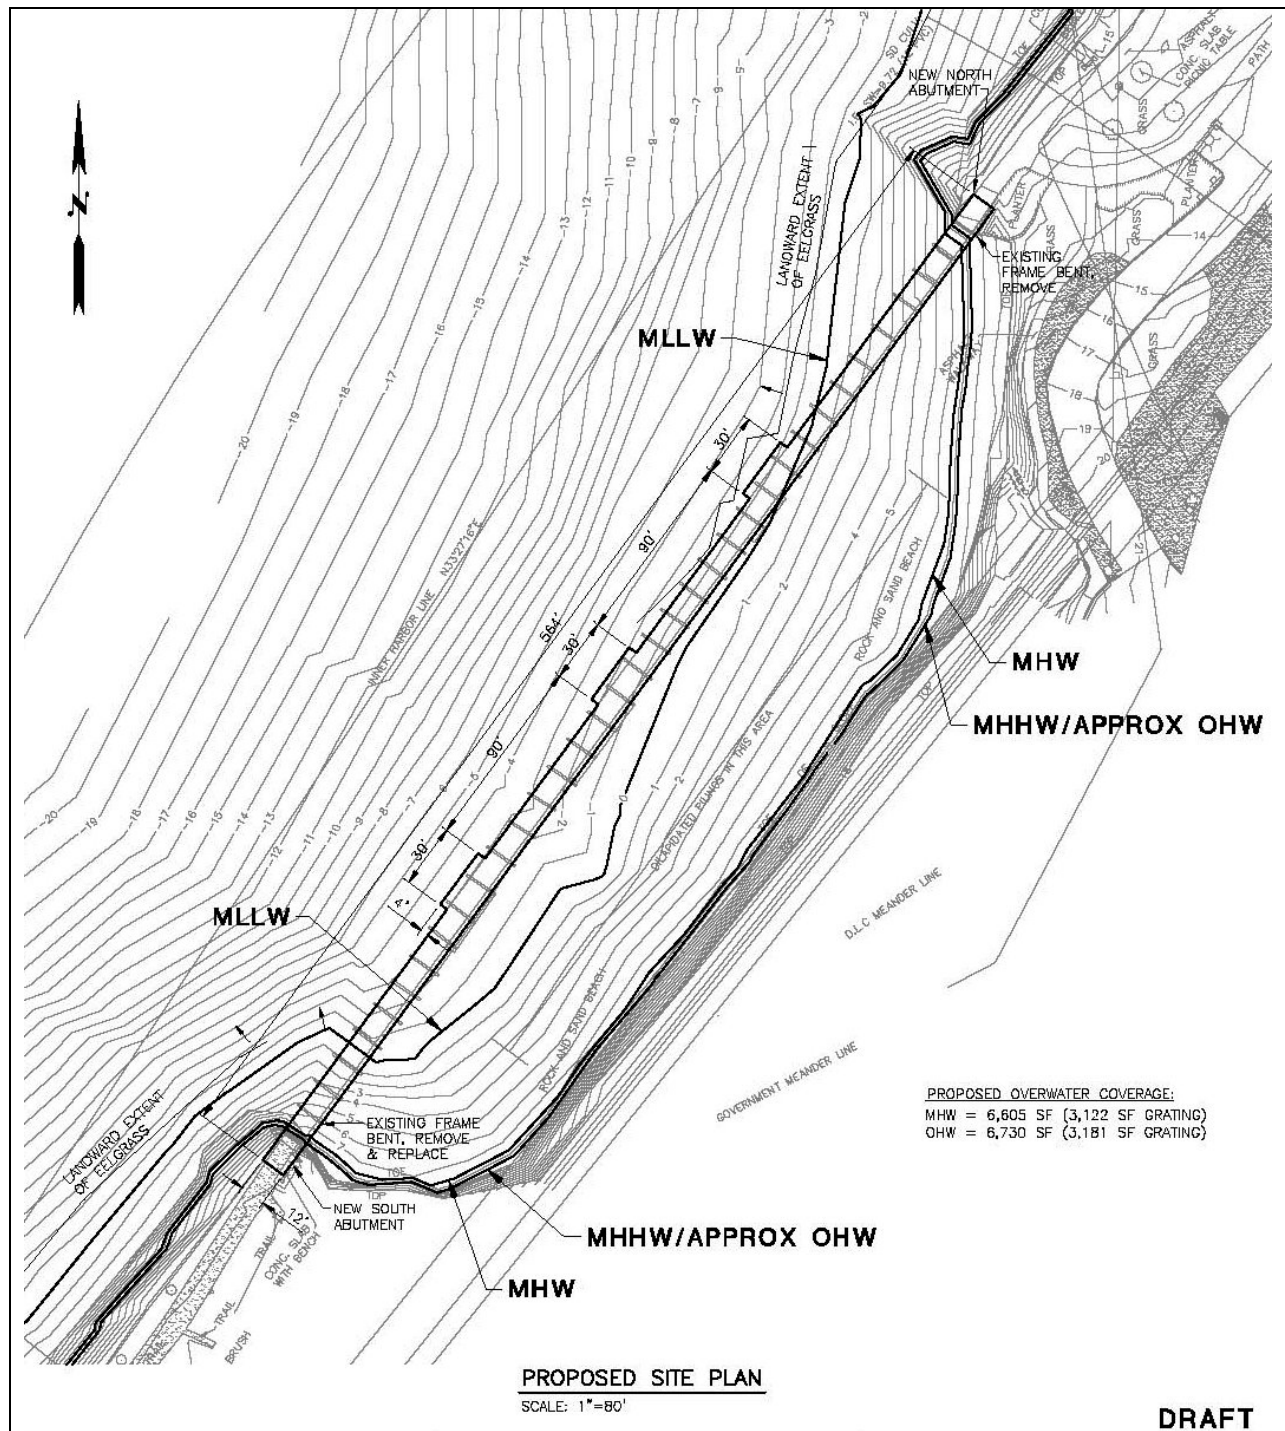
The Pattle Point Trestle Project Area, Boulevard Park, Bellingham, Washington.
